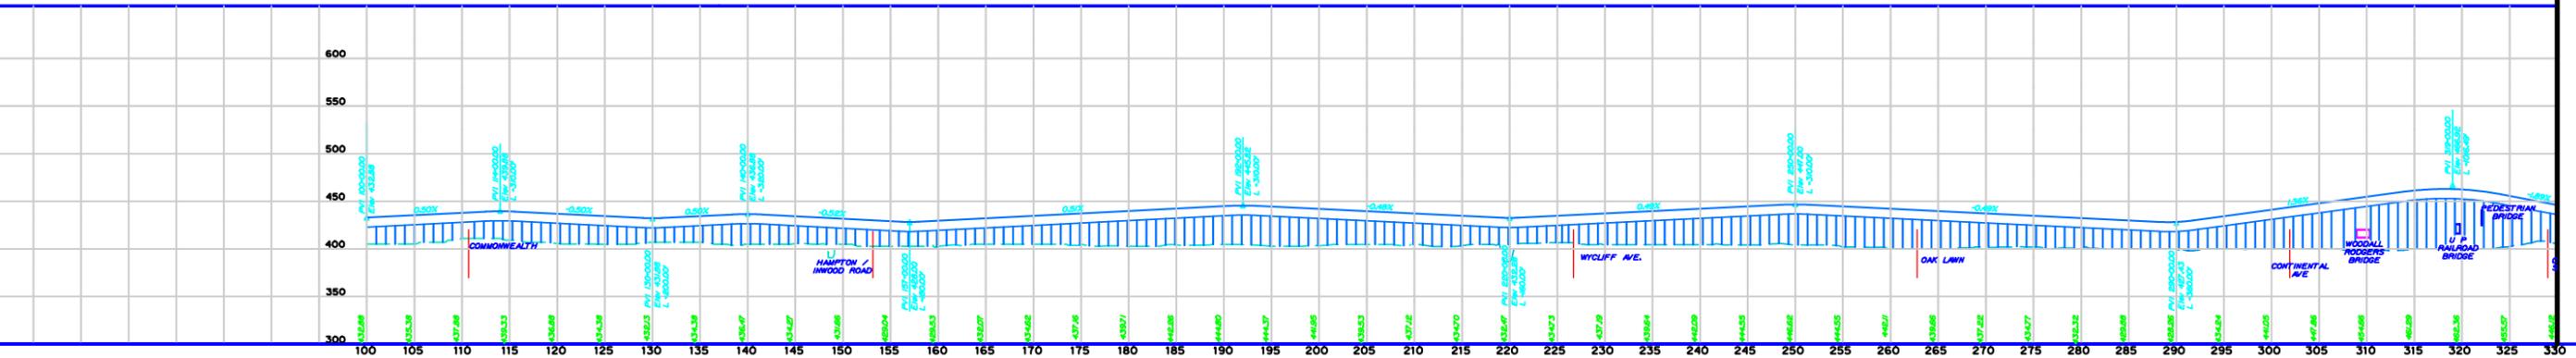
B ALTERNATIVE 2A IRVING / RIVERFRONT BOULEVARD ELEVATED (SOUTH)
